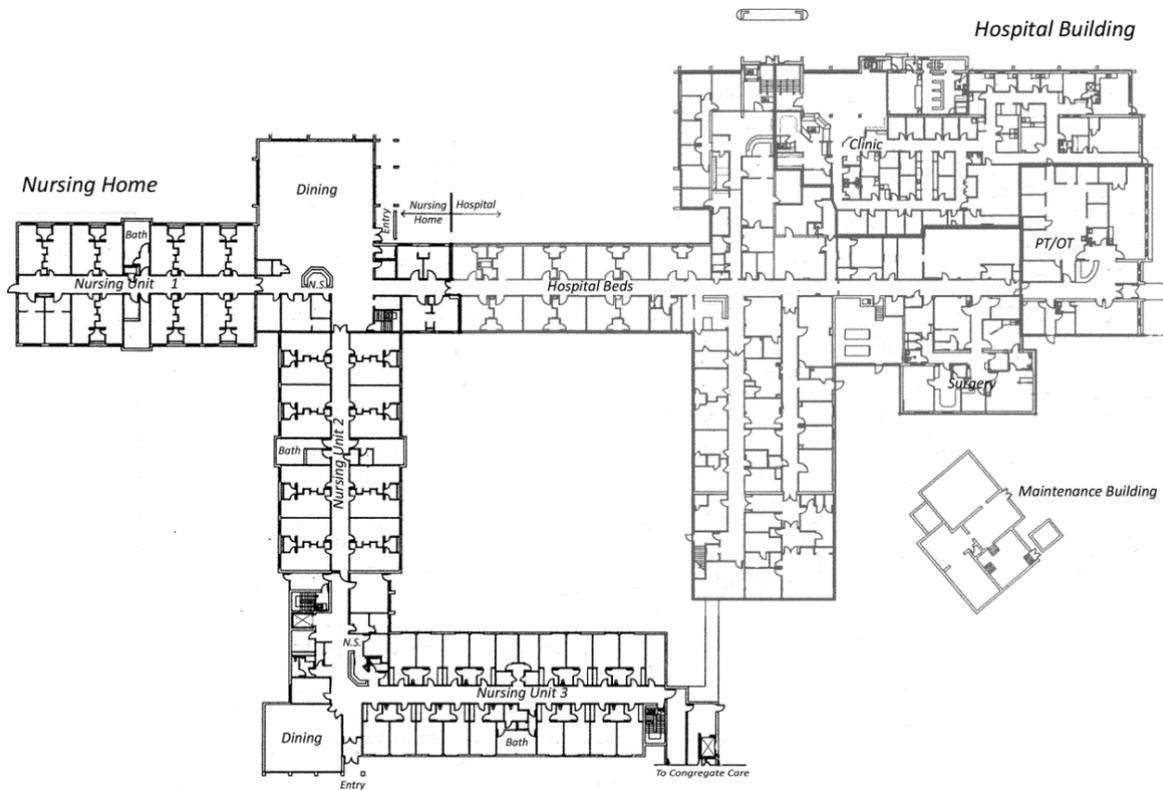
Prairie Town Home - Pre-Household Floor Plan
